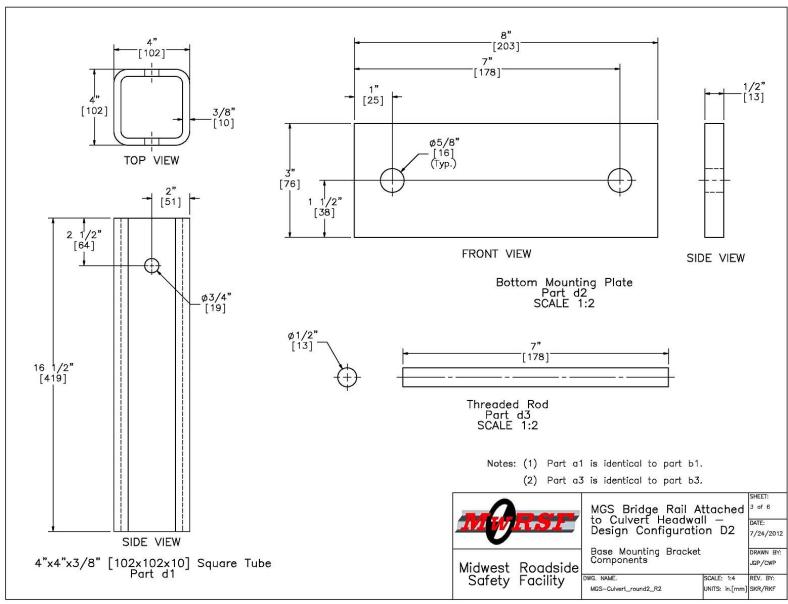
Design Concept D2, Tube and Bottom Mounting Plate Details
